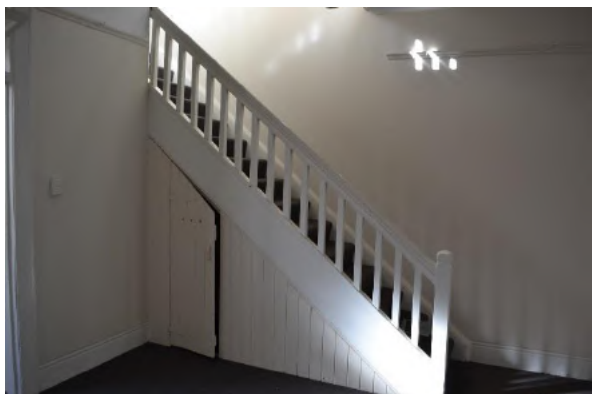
Living room (space 1.3)—50A / 48–56 Gloucester Street, showing original timber stair with closed sting, square balusters, moulded handrail, newel posts, and under stair cupboard. (Source: GML Heritage, July 2016)
